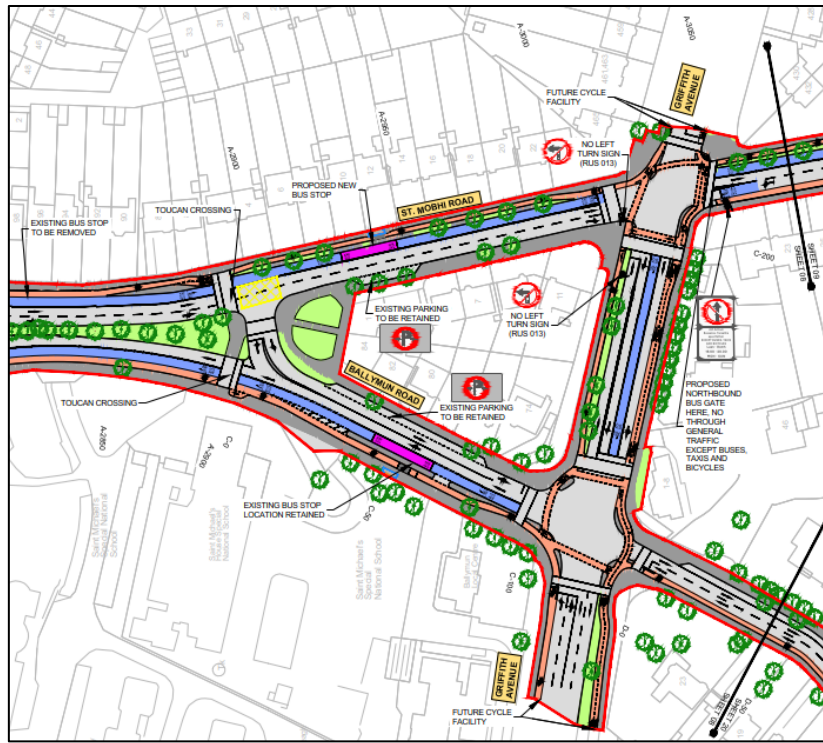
Extract from General Arrangement Drawing Sheet 8 (repeated from Section 1)
